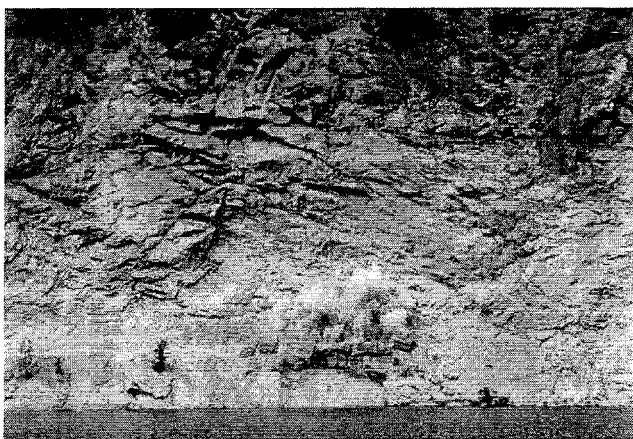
Blast to Lower Road Grade, Pioneer Road 40
